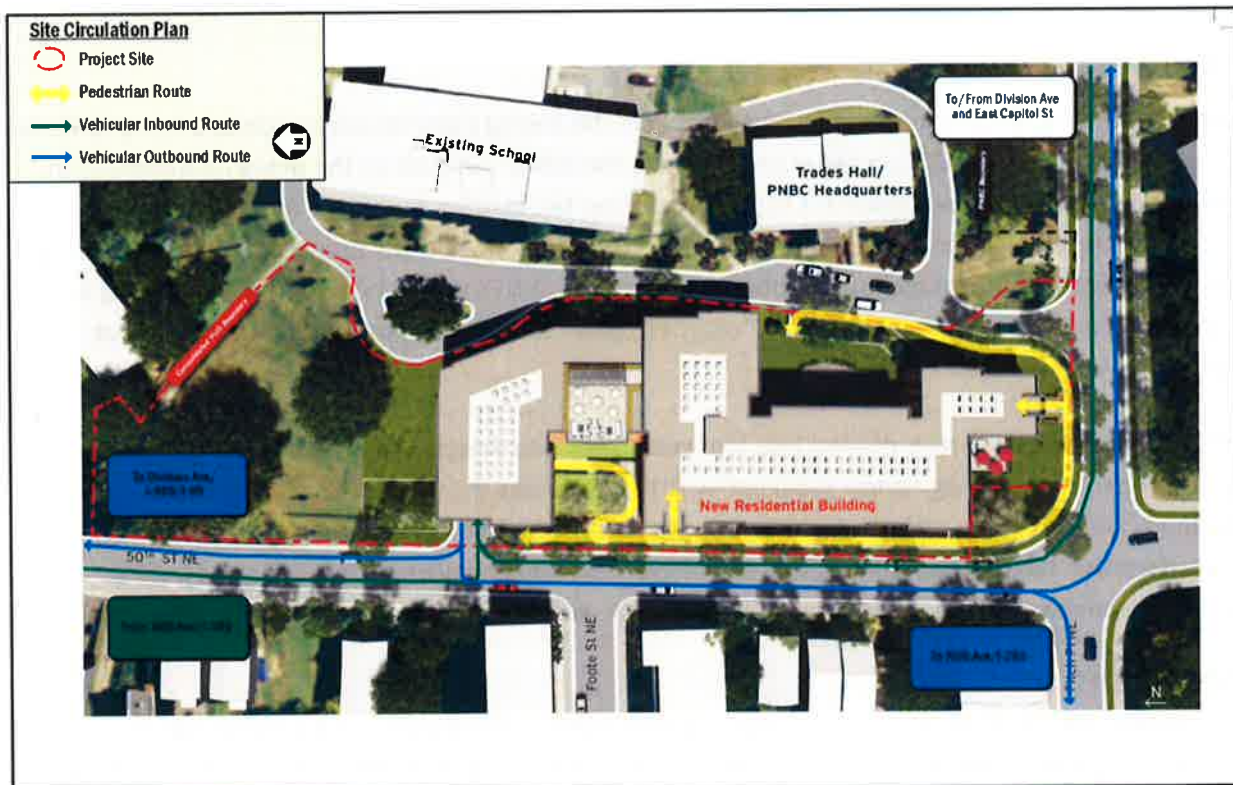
Site Design and Access (Source: CTR, Gorove/Slade, Figure 9, August 21, 2017)
